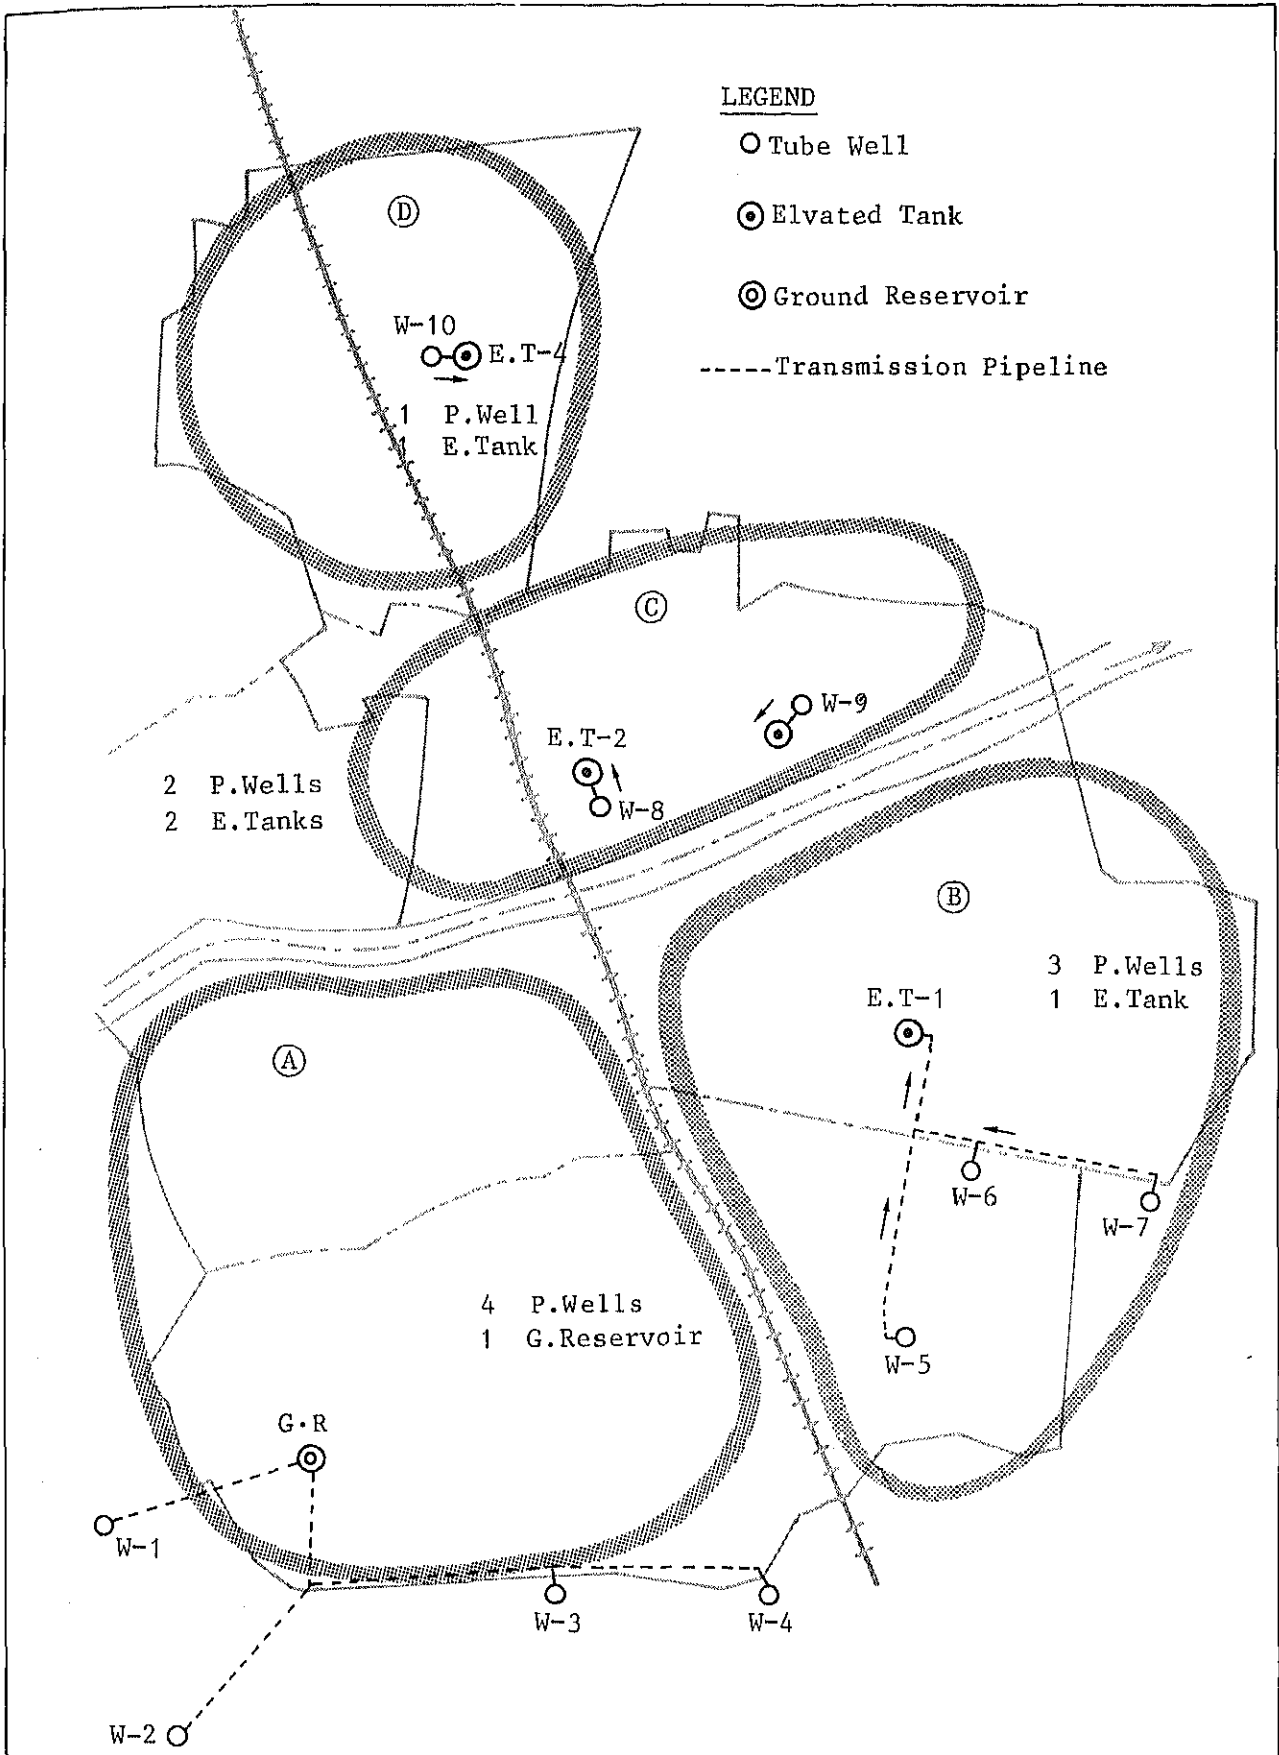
Layout Plan of Proposed Facilities
